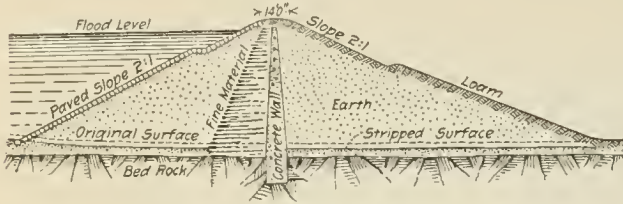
CROSS-SECTION OF EARTH DAM, with concrete heart-wall and upper slope paved; Metropolitan Water-Works, Southborough, Mass.
